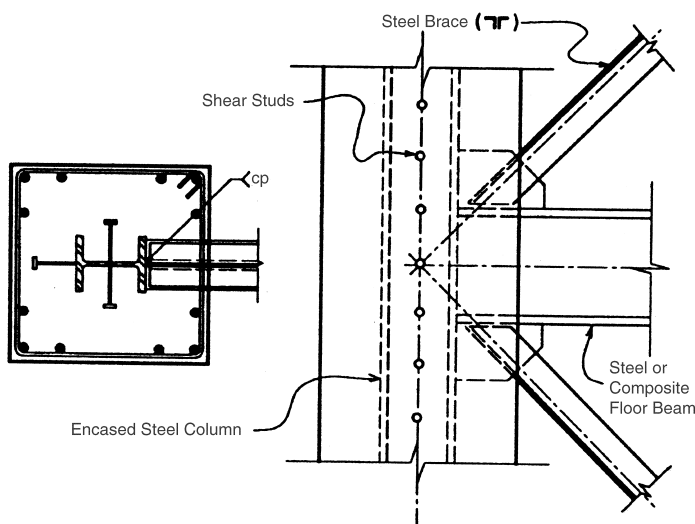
Reinforced concrete (or composite) column-to-steel concentric brace.
